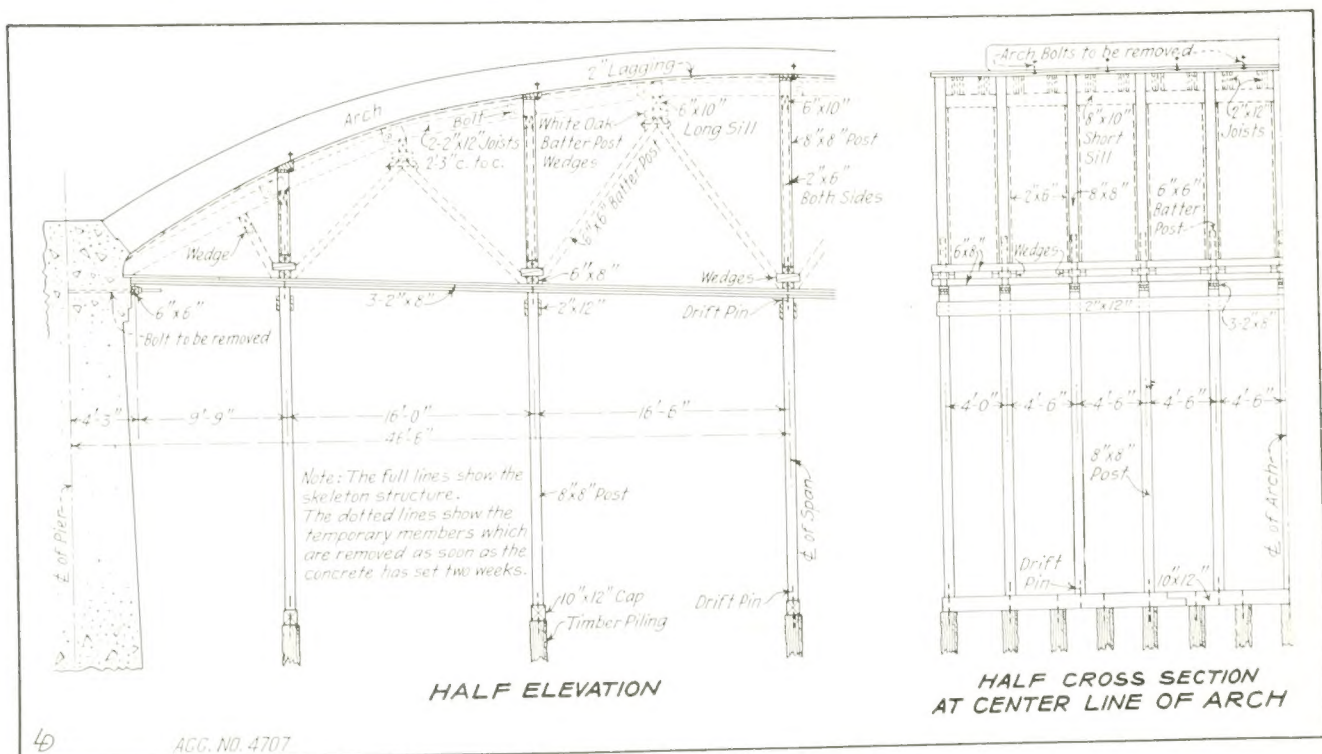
SKETCH ILLUSTRATING THE ARCH FORMS ON THE BLACK STREET BRIDGE.
